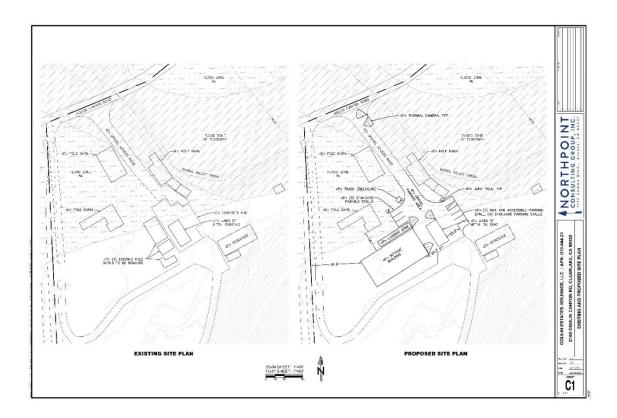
Project Site Plan (Refer to Attachment B for full plans)
